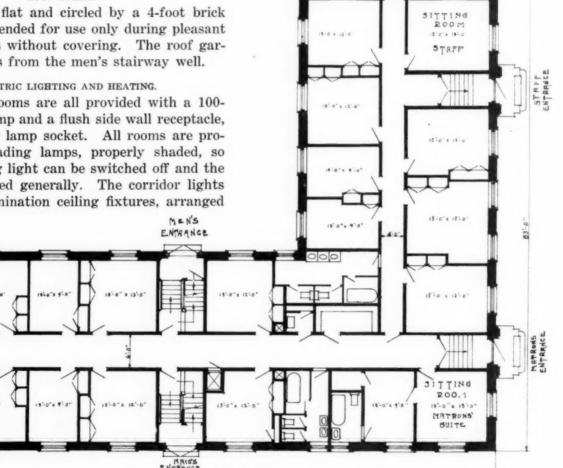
Grace Hospital-First floor plan of employees' service building.
